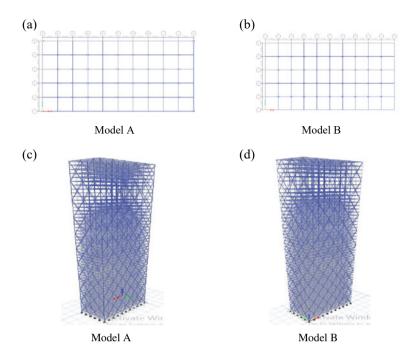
a Plan of the diagrid structure with corner columns b Plan of the diagrid structures without corner columns c Plan of the diagrid structure with corner columns d Plan of the diagrid structures without corner columns
